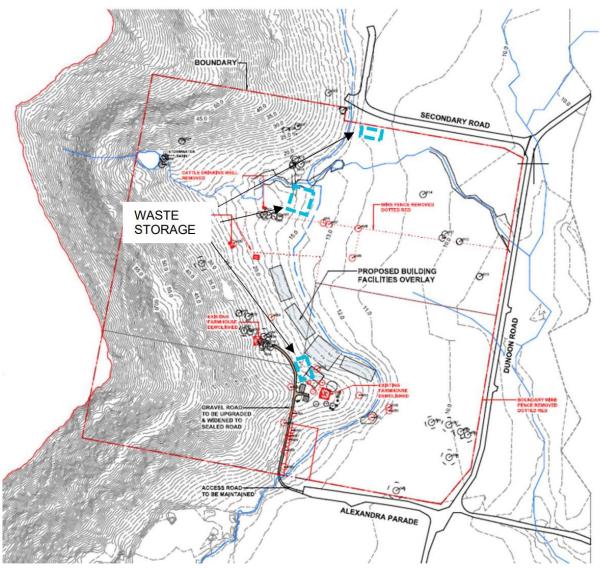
Indicative location of on-site waste storage areas (Source: GHD)
